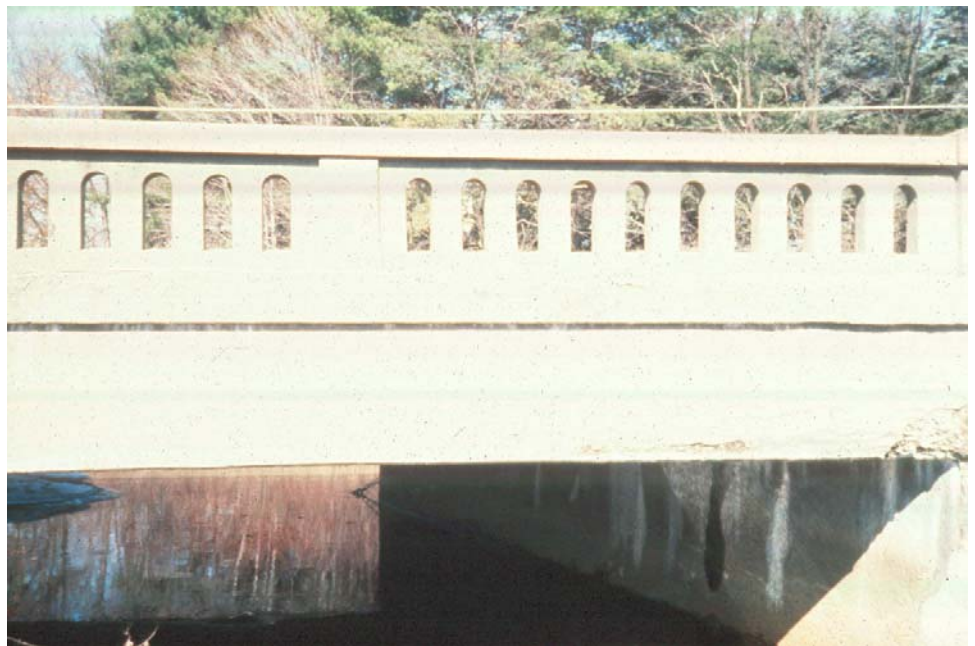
Deteriorated Tee Beam End Due to Drainage
